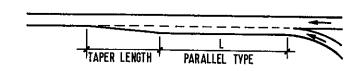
SINGLE LANE EXIT RAMPS
